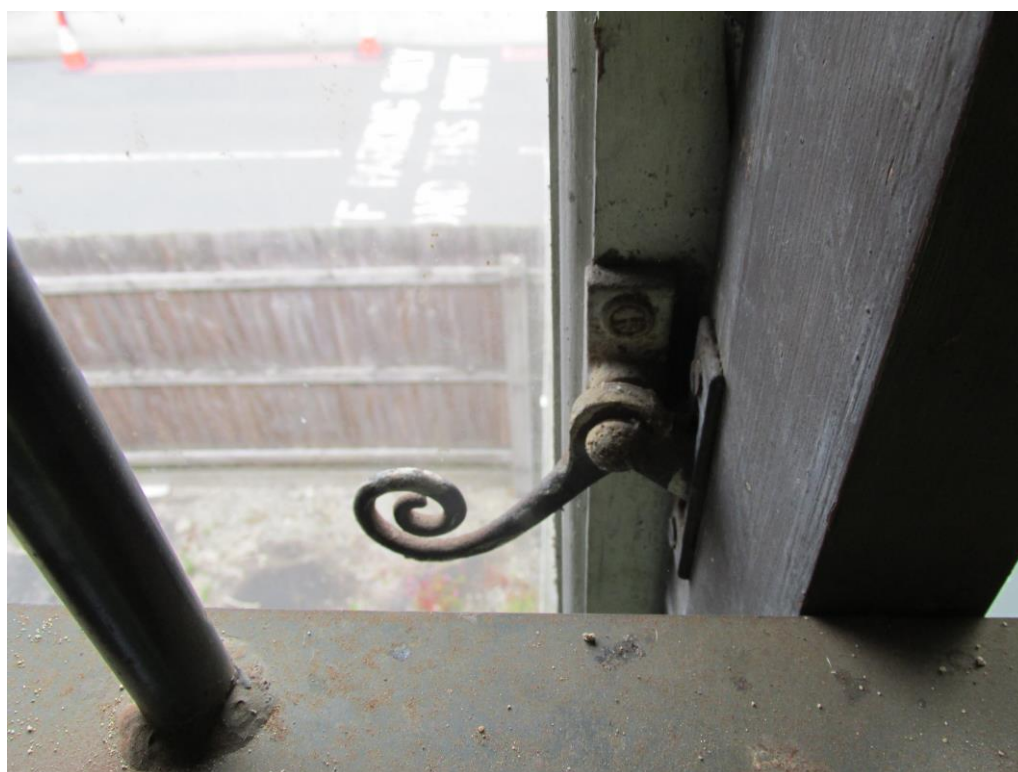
Example of scrolled iron window latch in casement window on upper floor of central range
